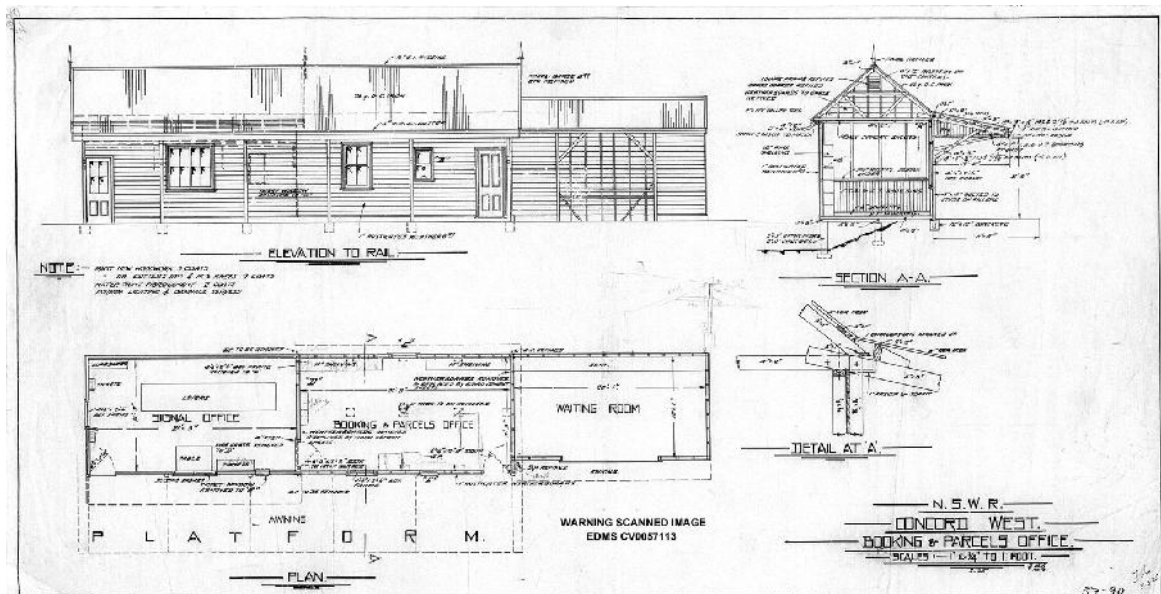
Plan of proposed bookings & parcels office on the Down platform, Concord West Station, 1925. (RailCorp Plan, Ref: 0057113)
